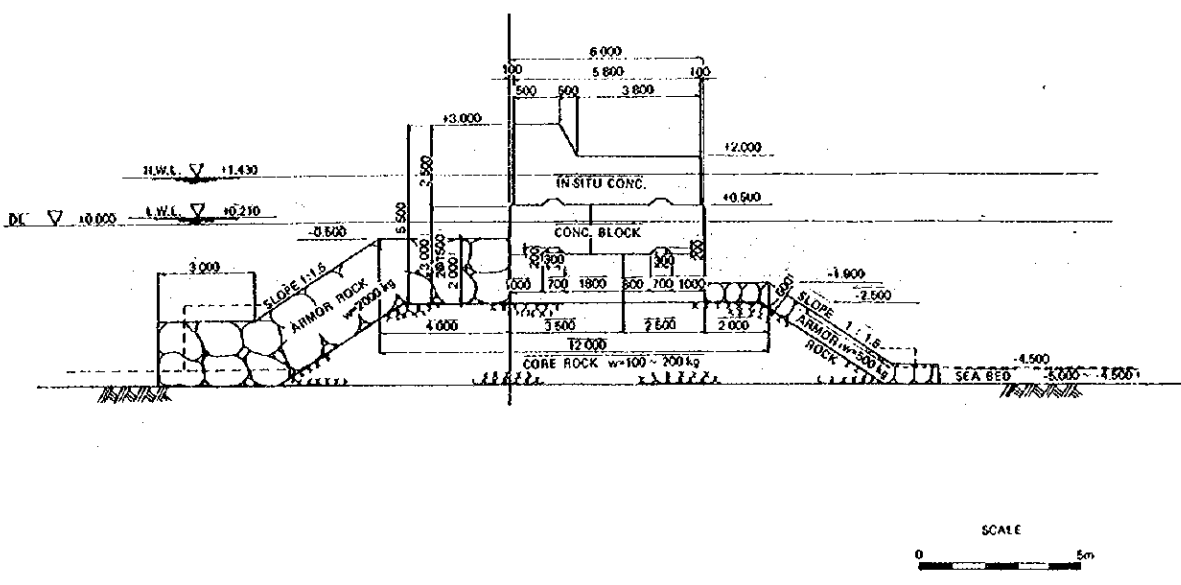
Cross Section of Breakwater (3) – Lucena Port
